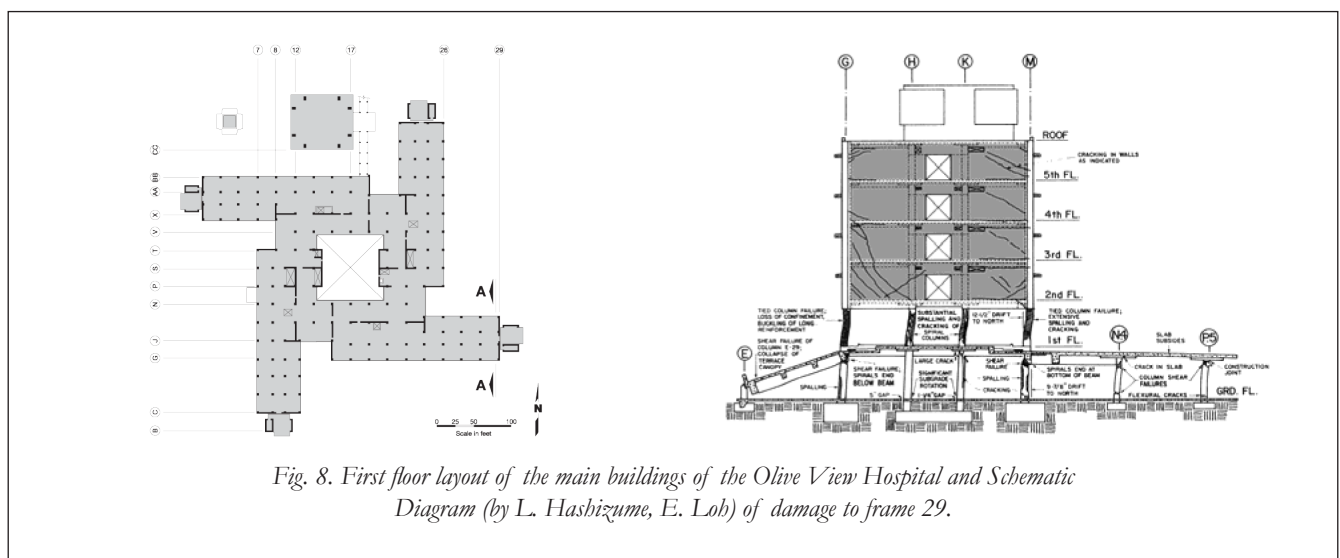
First floor layout of the main buildings of the Olive View Hospital and Schematic Diagram (by L. Hashizume, E. Loh) of damage to frame 29.
